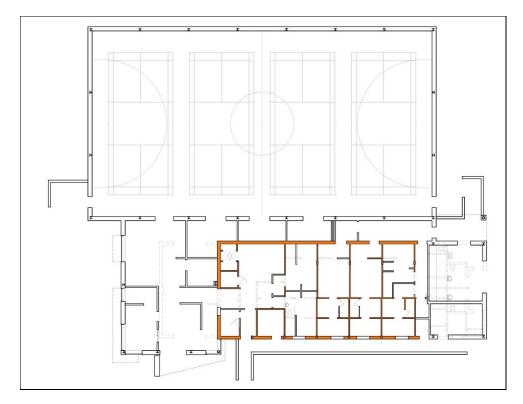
Simplified Ground Floor Plan showing extensions, areas of existing building to be retained, and accommodation to be demolished (indicated by dashed lines)
